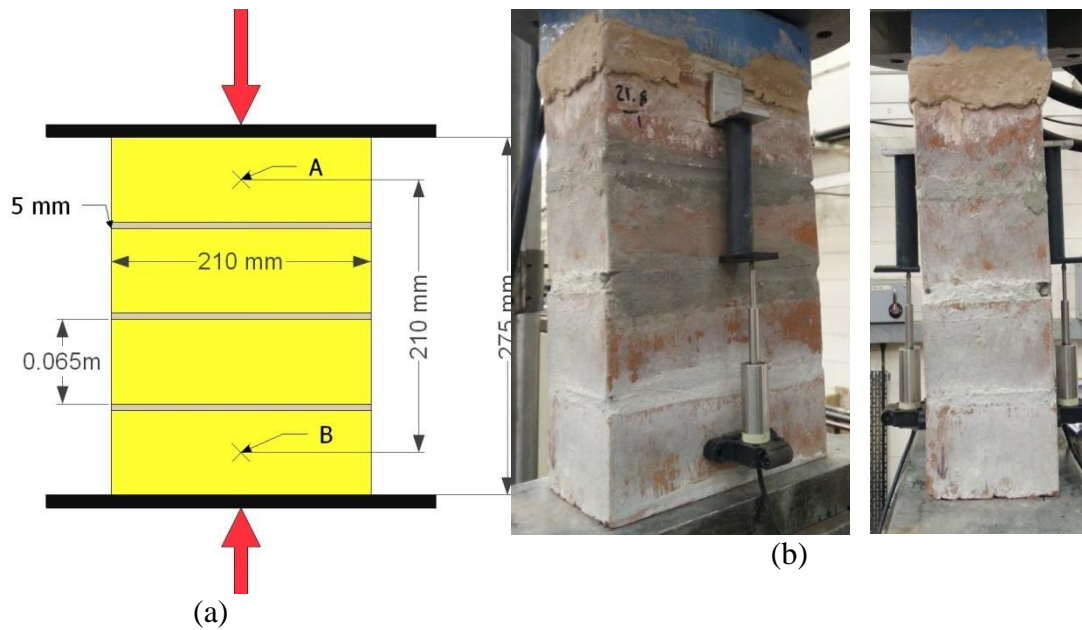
Brickwork compression test: (a) dimensions of specimen, (b) test setup
